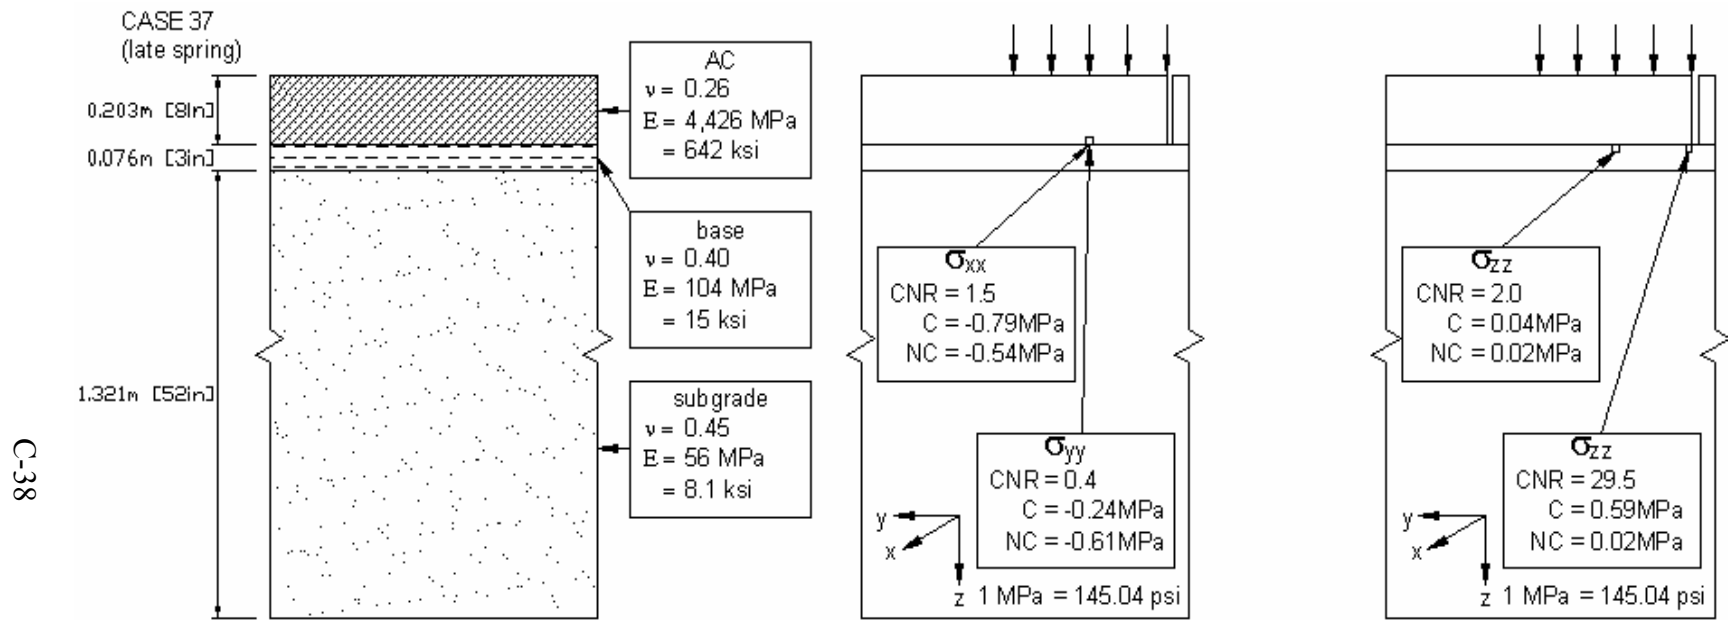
Summary cross section for case 37, (C – stress in cracked pavement, NC – stress in pavement with no crack, CNR – crack/no crack (stress) ratio)
